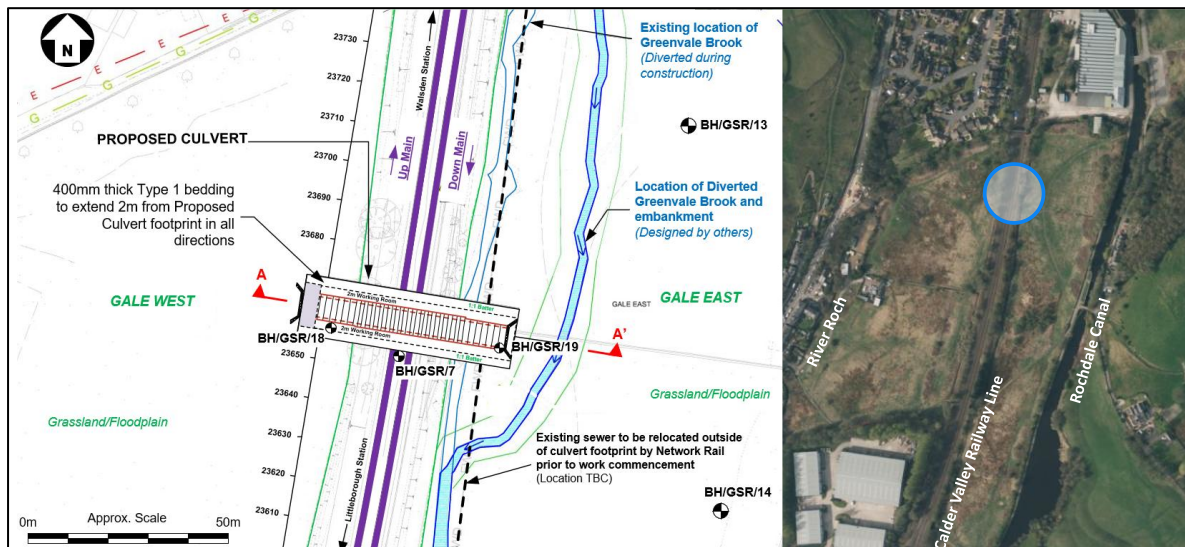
Site plan showing location of the box culvert in relation to the Network Rail Calder Valley Railway Line and Greenvale Brook.
